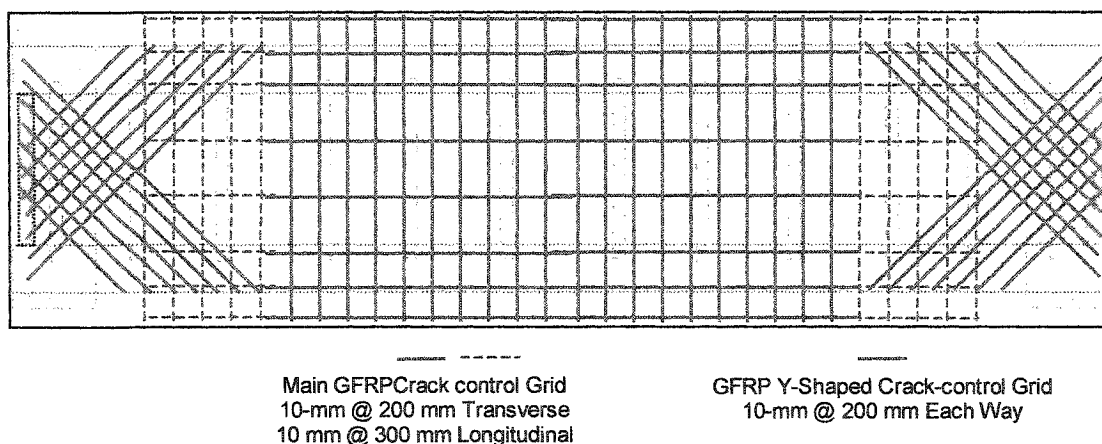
Proposed Arrangement of Crack-Control Reinforcement
